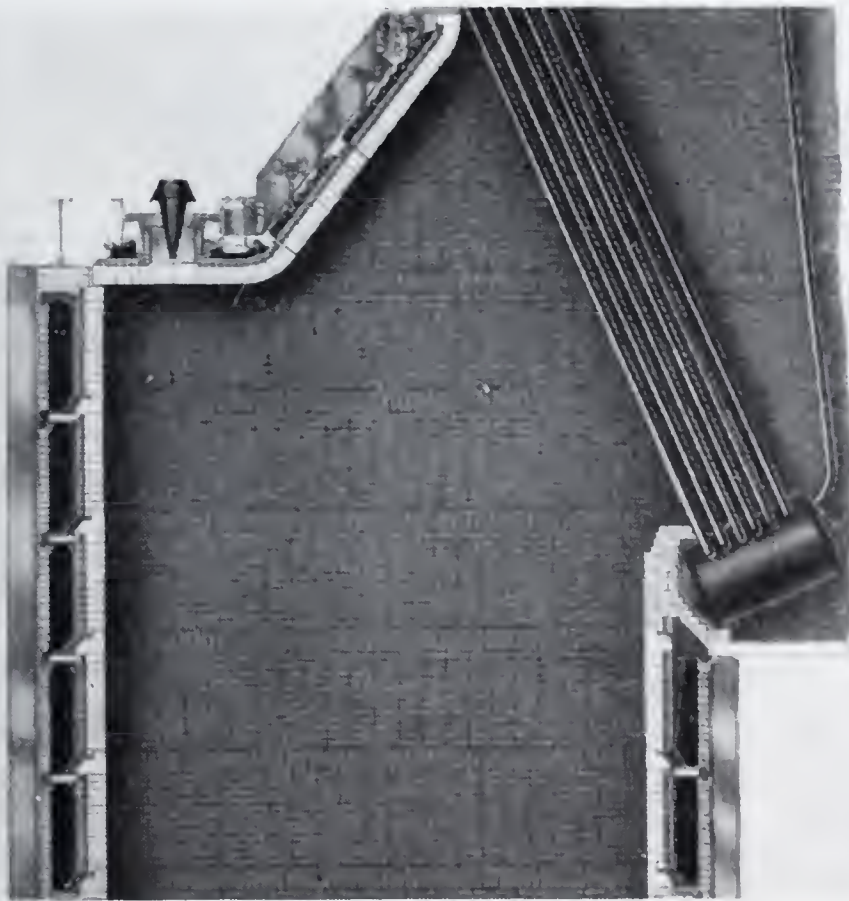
Application of Suspended Arches and Suspended Wall in Connection with Pulverized-Fuel-Fired, Edgemoor, Single-Pass Boiler.
